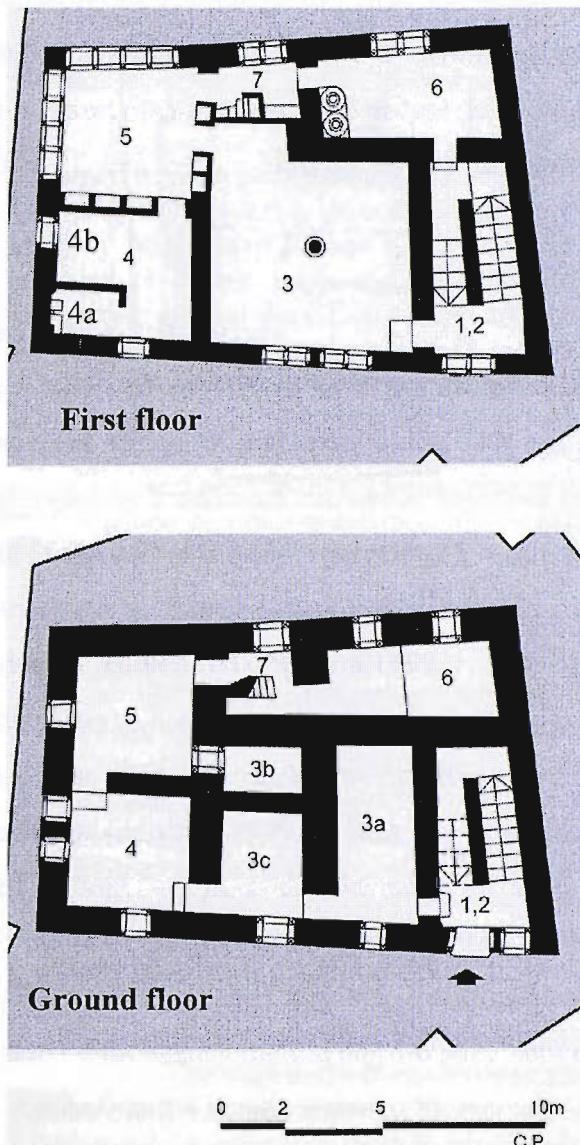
Plans of the ground and first floors of the West House (from Palyvou 2005a, p.47)
